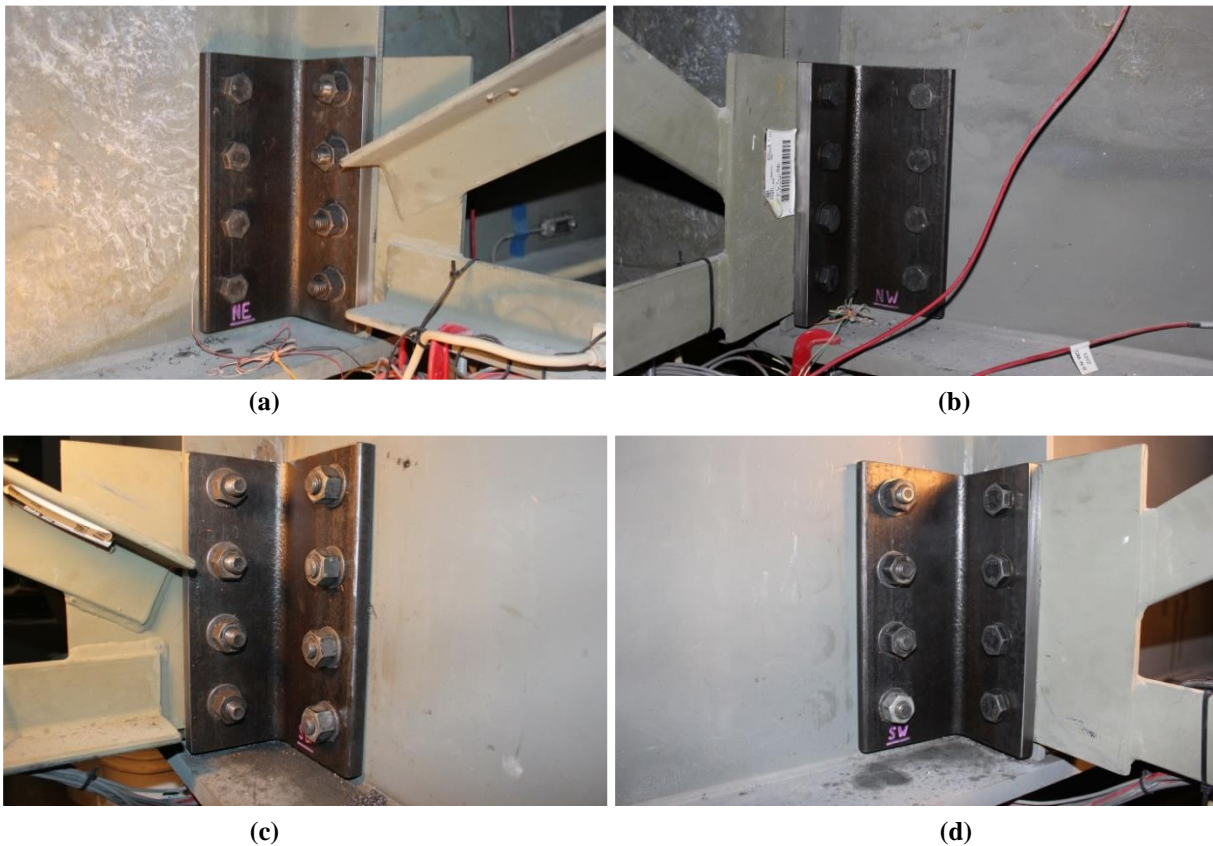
South cross frame connection plate four-angle repair from (a) northeast, (b) northwest, (c) southeast and (d) southwest face of center girder.
